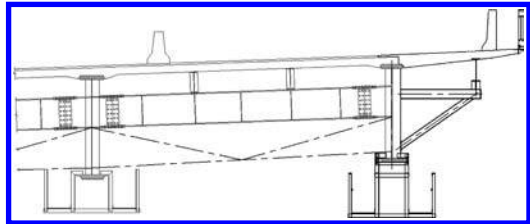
Partial cross-section of Port Mann Bridge approach spans, original material shown grey, new widening and inspection walkways in black.
